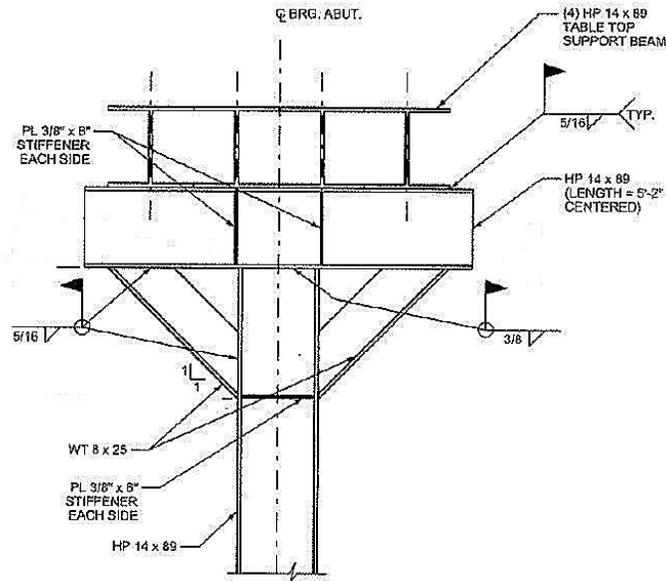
End view of the I-80 at Wanship pile top design without abutment and end approach bracing for the WB and EB bridge
